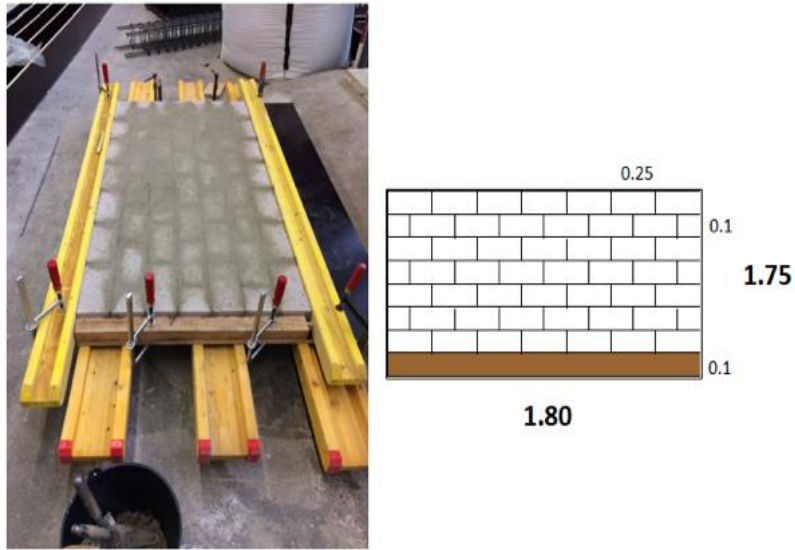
Geometry of masonry walls tested in the bending test and illustration of the wall.
